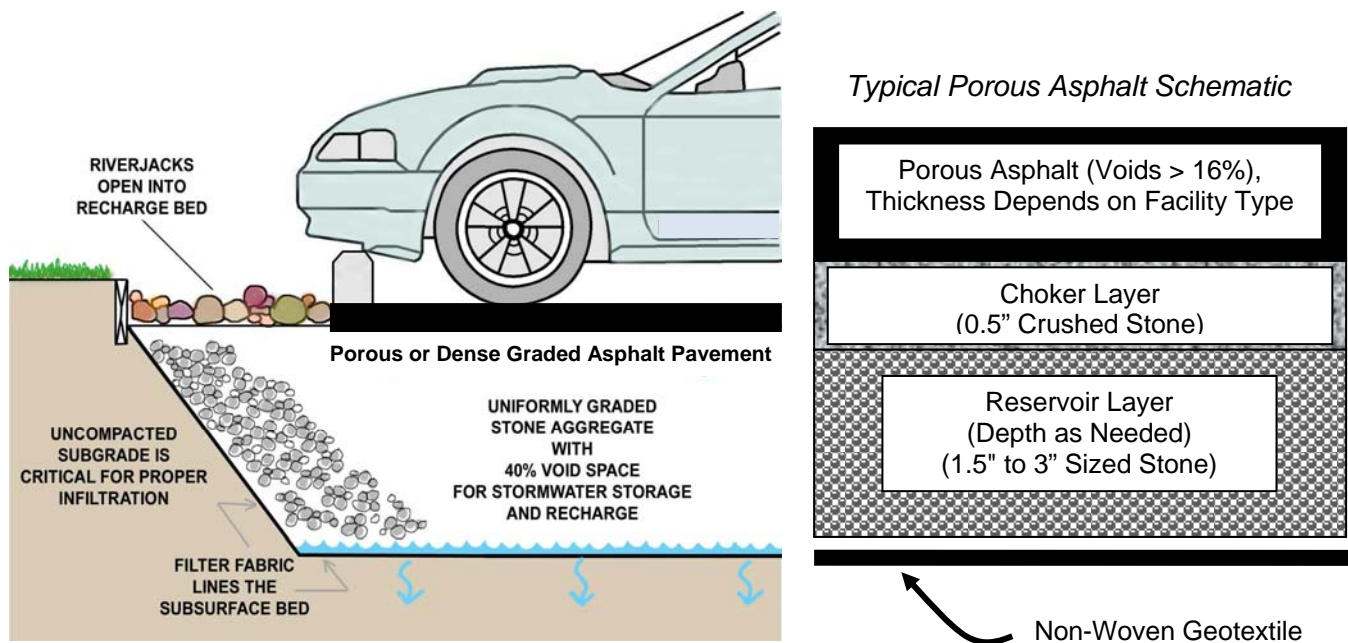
MANAGING STORM WATER WITH ASPHALT PAVEMENT
